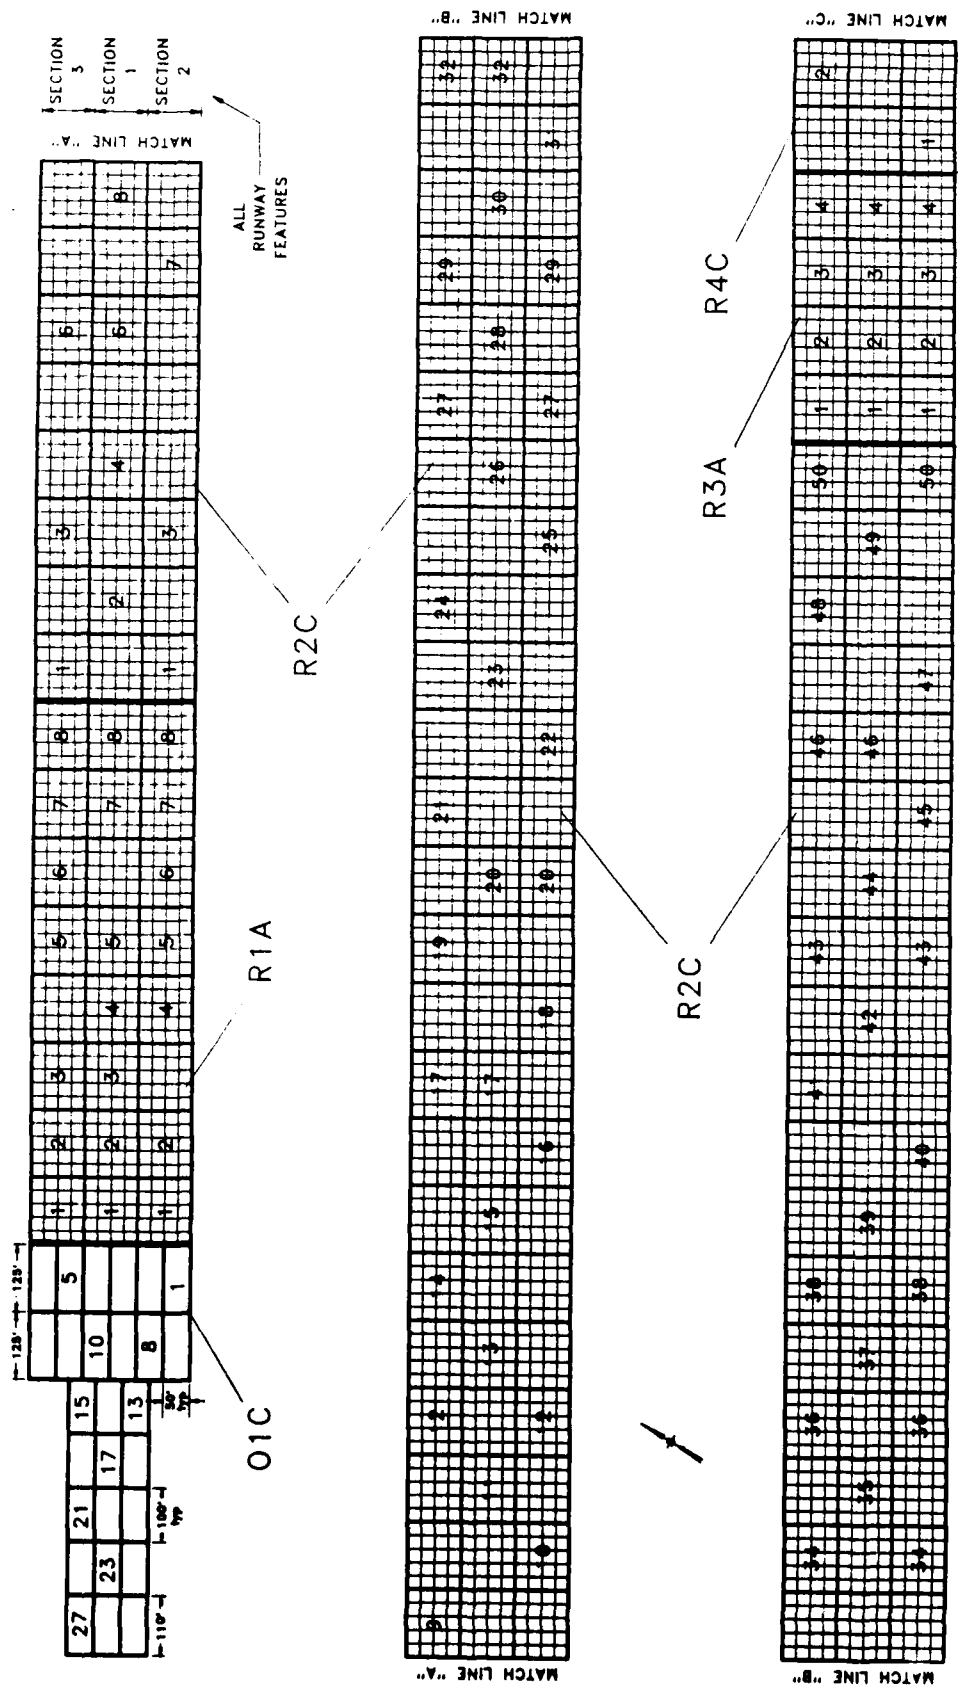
Sample unit layout, Runway 4-22 (features R1A, R2C, R3A, and R4C) and Runway 04 overrun (O1C)
